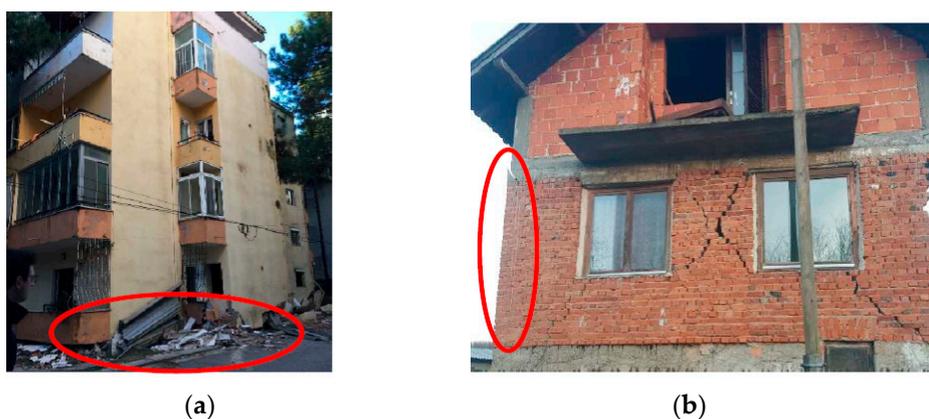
Damage to CM buildings in recent earthquakes in the Balkan region: (a) the collapse of a building with a mixed RC and CM system due to the November 2019 Albania earthquake and (b) the damage to a masonry building with URM walls at the ground-floor level and the CM walls above due to the December 2020 Petrinja, Croatia, earthquake. ((a): Red ellipse shows damage of the loggia at the ground floor level; (b): Red ellipse shows vertical tie-column elements are omitted. That is reason of the high level damage of CM structure, in this case).
